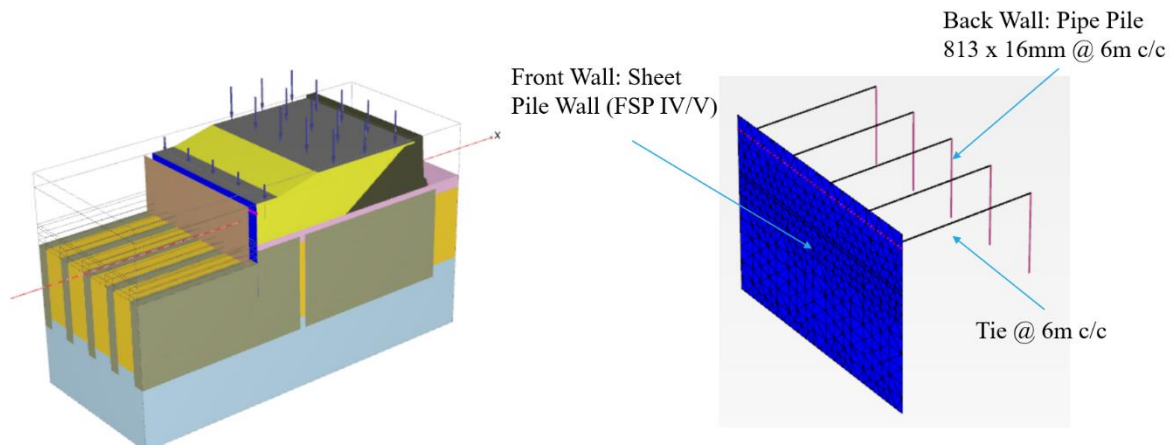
Back wall modelled as individual piles in PLAXIS 3D (modified approach)
